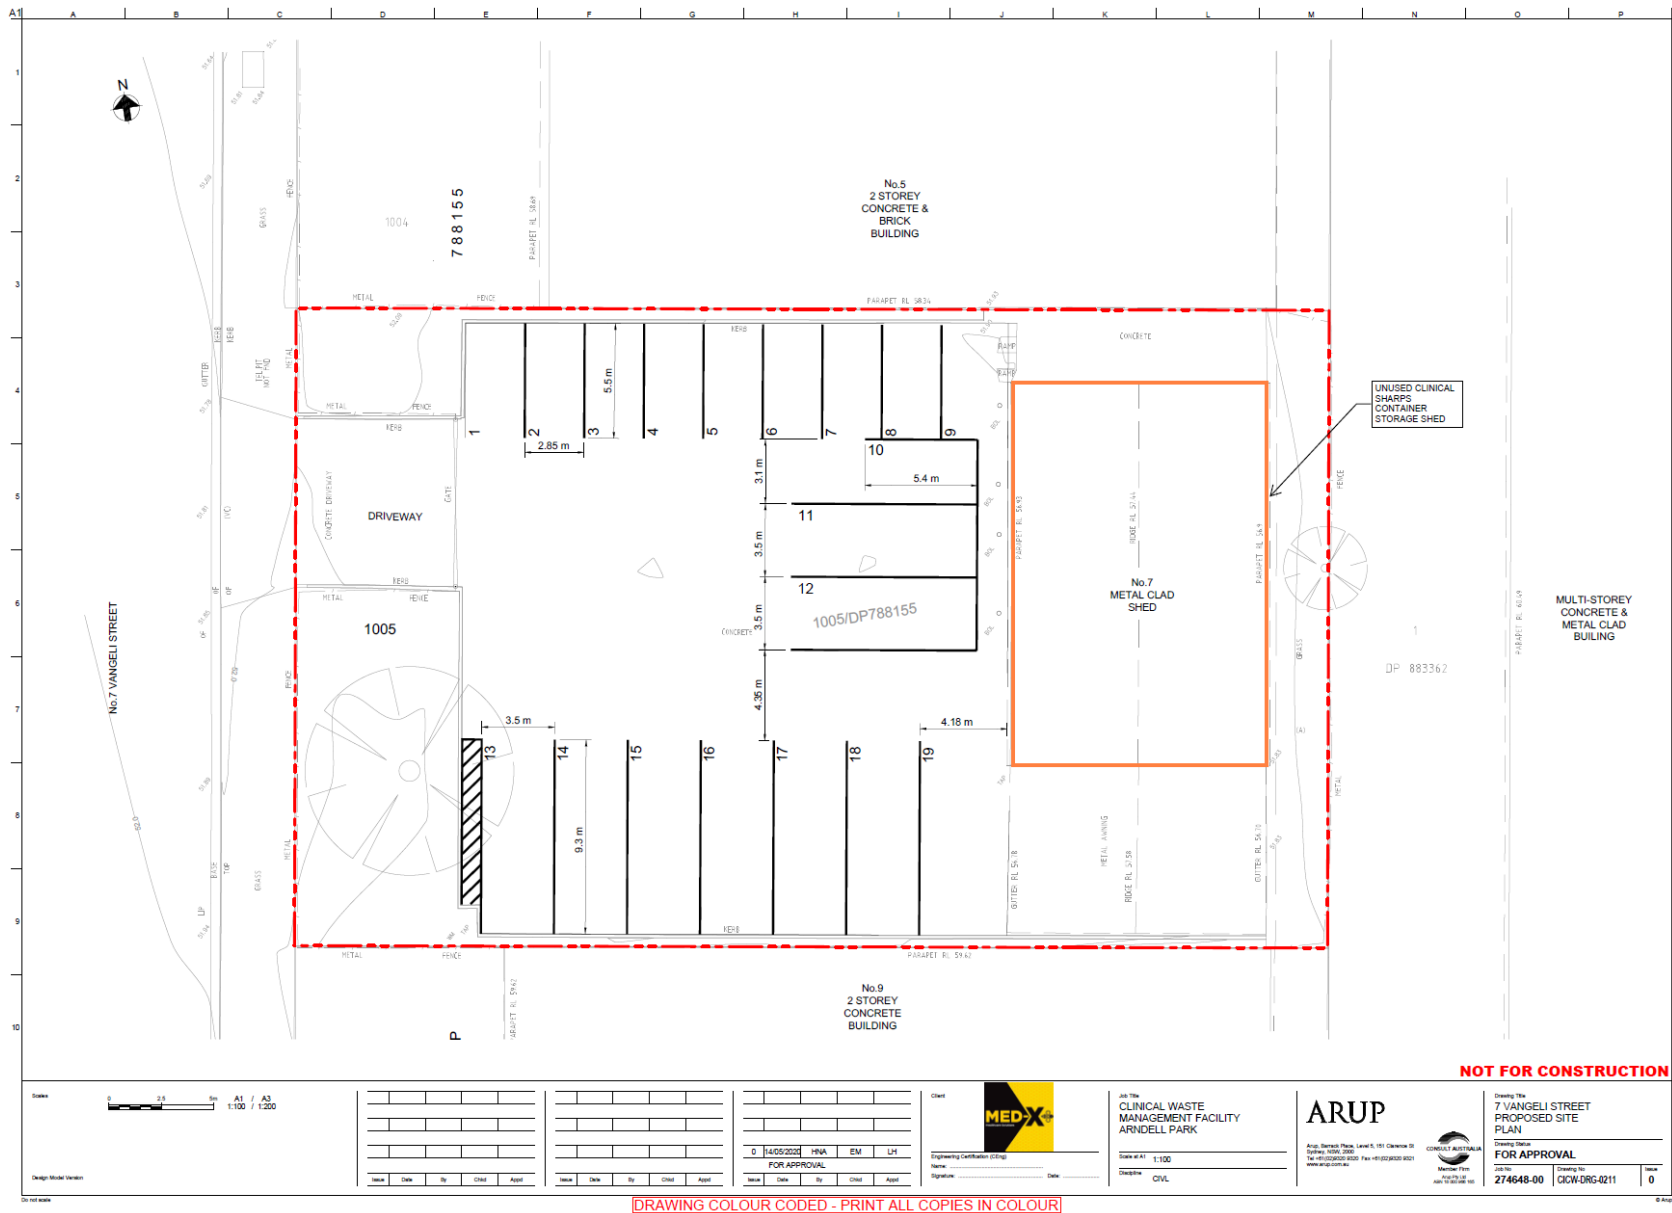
7 Vangeli Street, Arndell Park Site Plan
